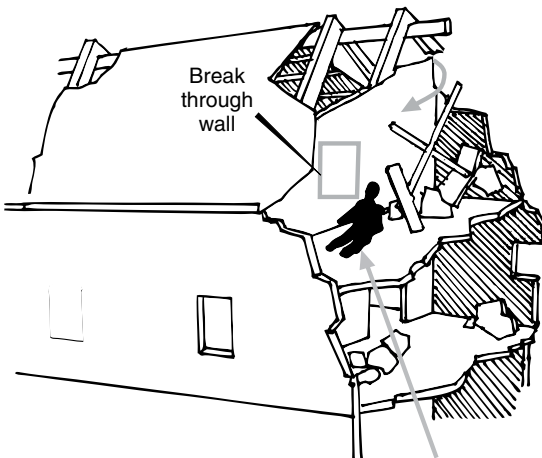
Salvage from a swallow's nest is difficult and requires specialists with a crane or who can break through the wall. It may be possible to bring a dog to a swallow's nest up a ladder on an outside wall with an airlift harness.
